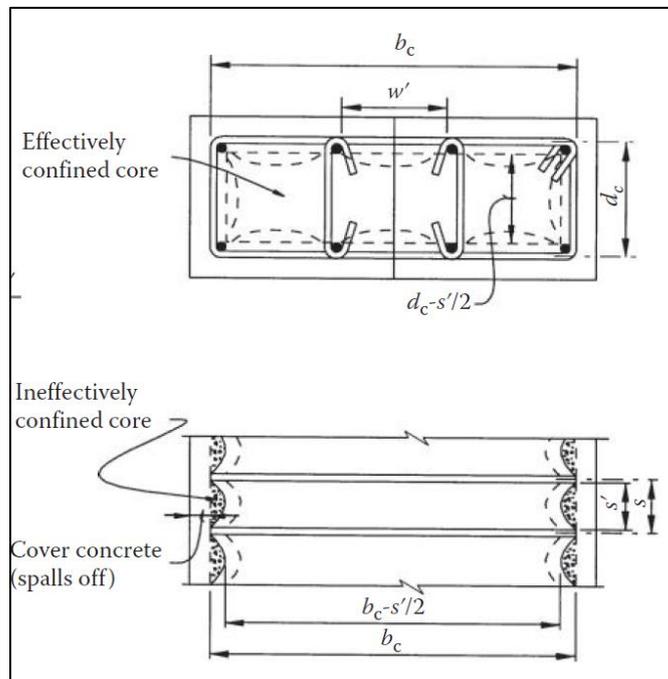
Confined core for rectangular hoop reinforcement (Chen et.al 2014)
